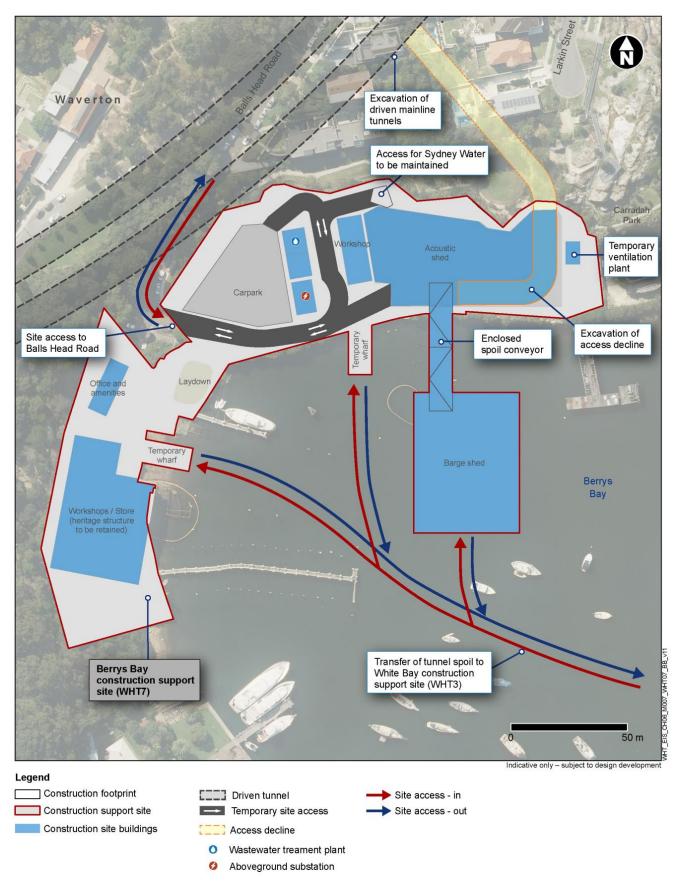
Indicative construction support site layout – WHT7 – Berrys Bay
